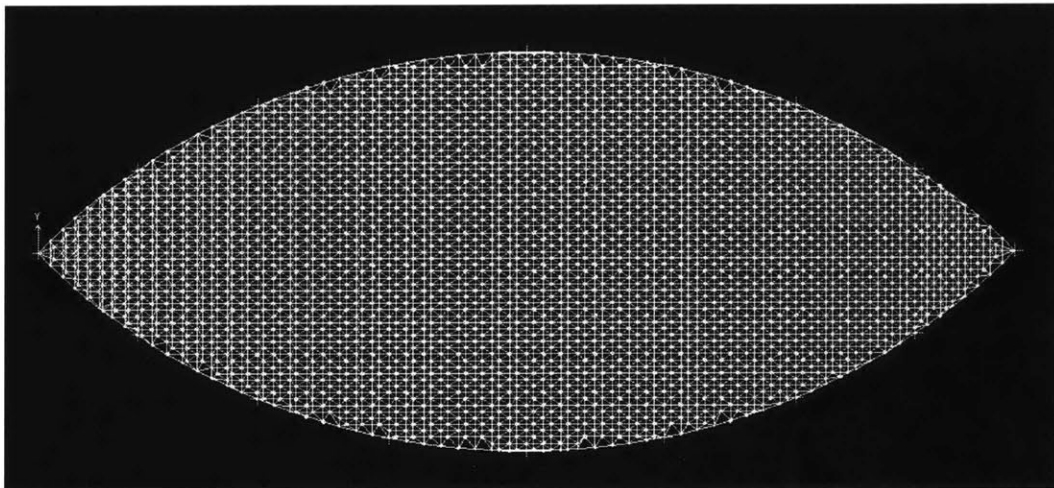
PLAN VIEW OF THE STRUCTURE IN SAP
